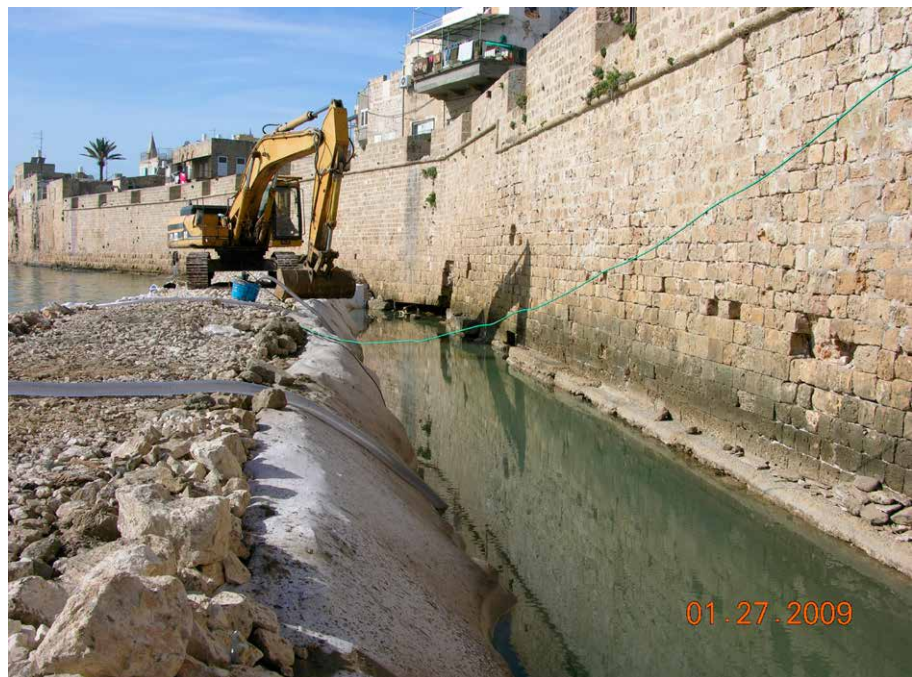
Building the dam along the foot of the seawall. The area between the wall and temporary rampart/service road was divided into six separate pools, from which the water was pumped out in succession as the archaeological and conservation works progressed (Photo: D. Planer).
